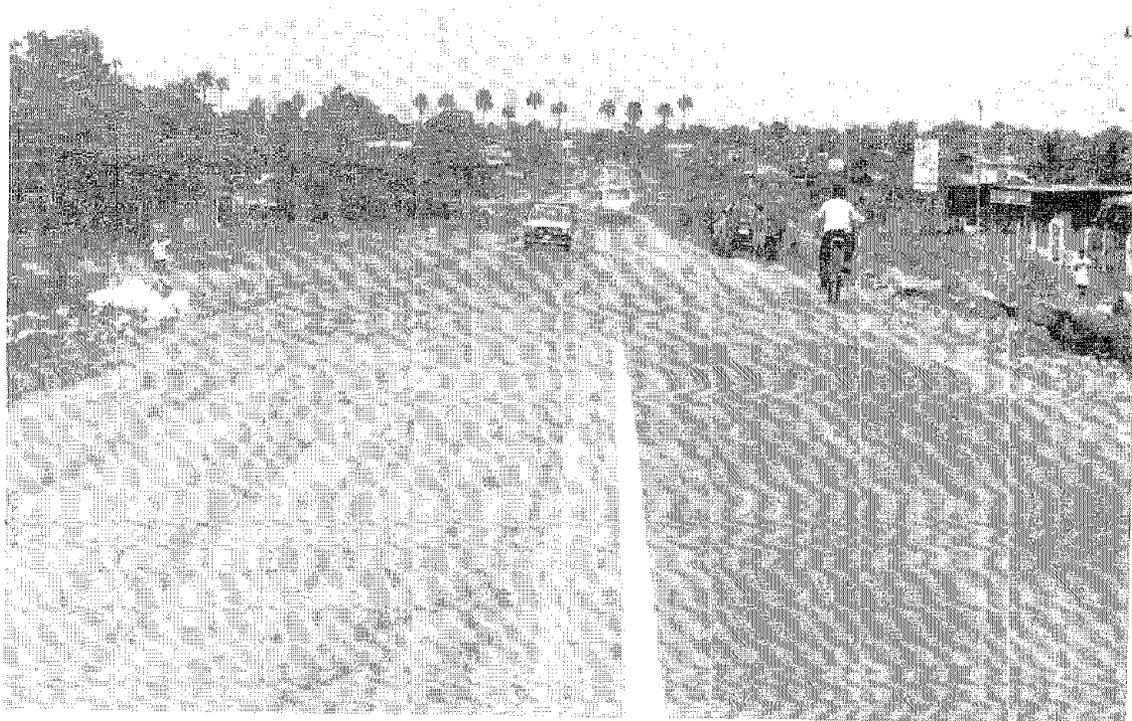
View Looking East Showing 13 m (42 feet) of Road Damage near Railroad Underpass. RCCP Transmission Line to Right.
